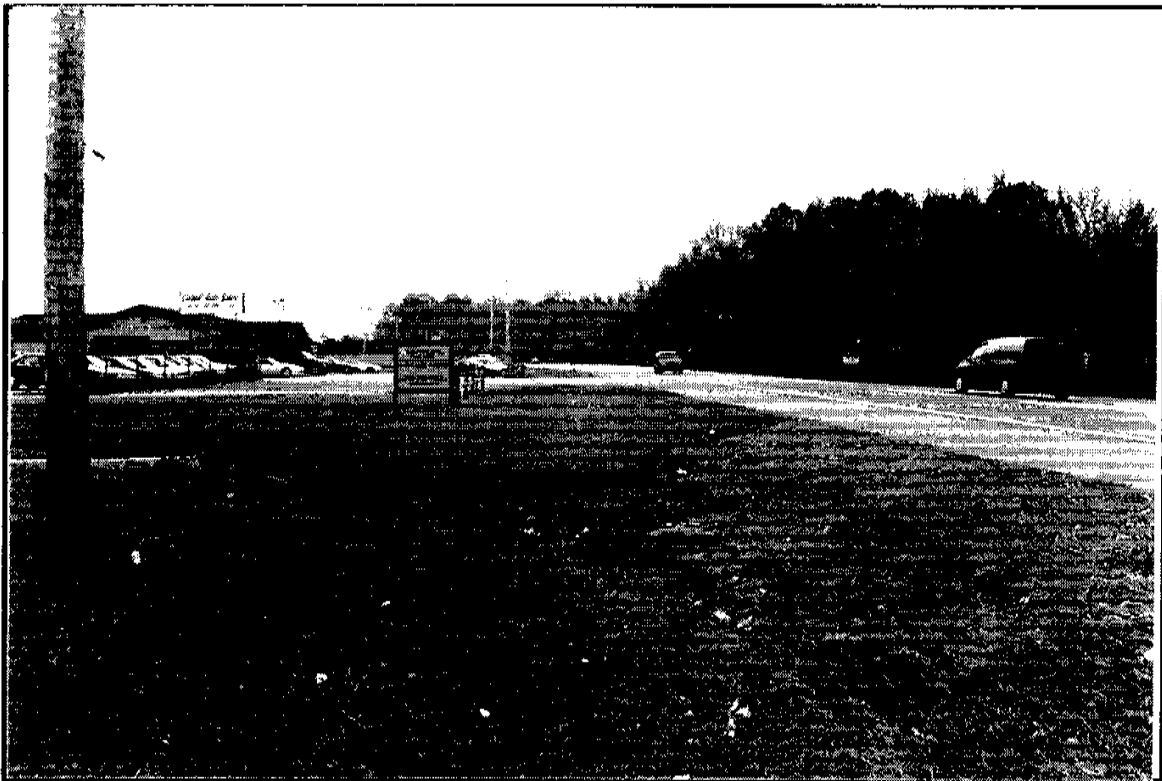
Overview from the northwest project area boundary, looking southeast along Churchmans Road.
